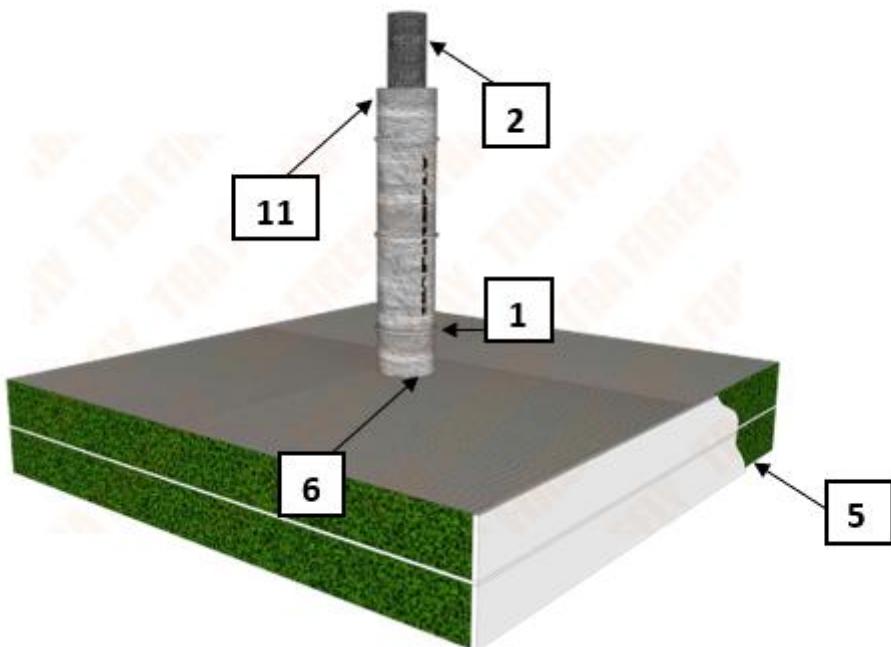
8mm up to 48.6mm OD Steel Pipe through horizontal double TBA Firefly™ Intubatt Seal
